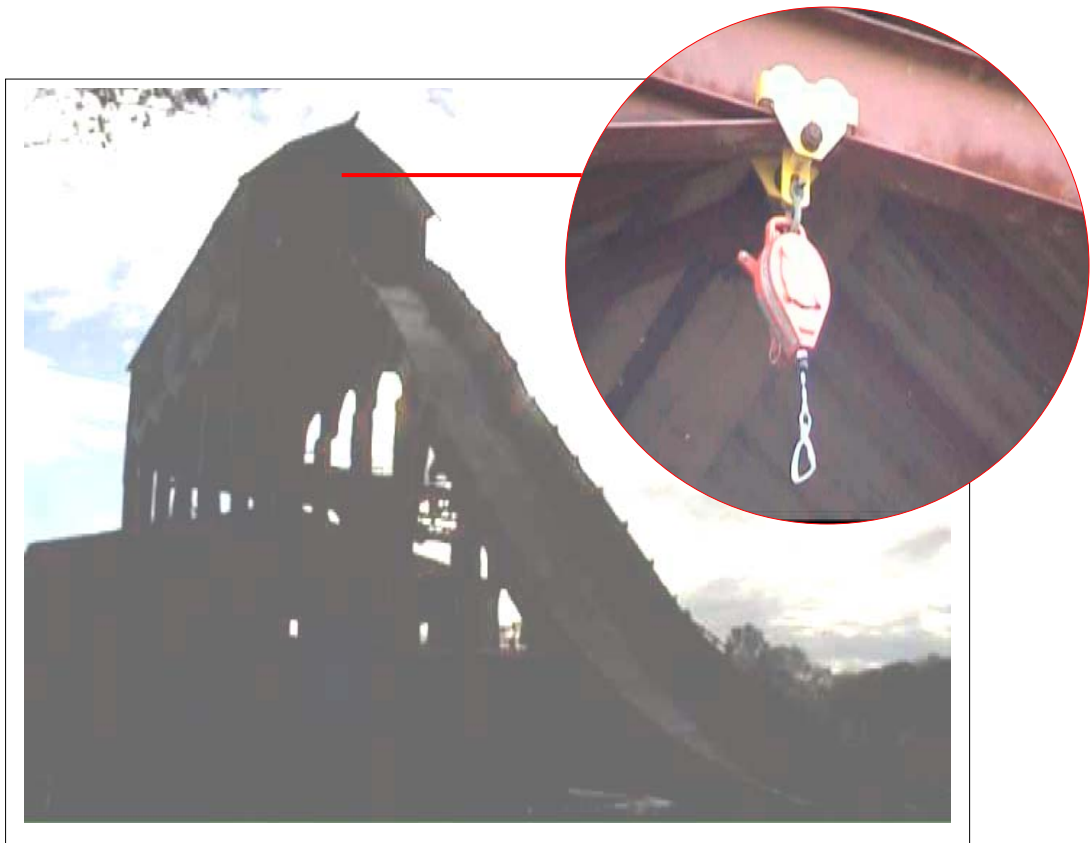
RETRACTABLE FALL ARRESTERS USED ON SLOPED CHUTES
